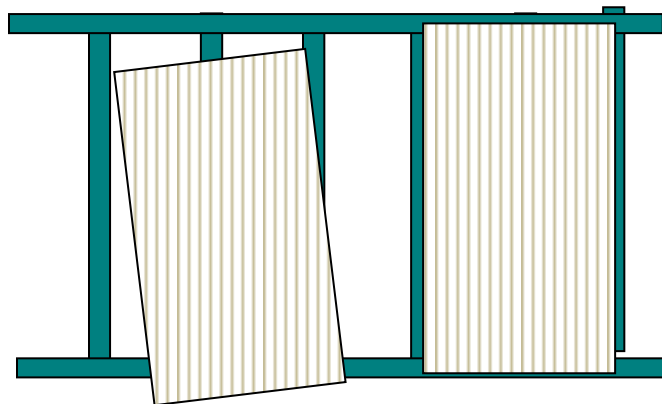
Oriented strand board sheathing (OSB) installed for wall sheathing. Edge nails should be spaced 6 inches apart and field nails 12 inches apart. This type of sheathing does not require strap bracing.
